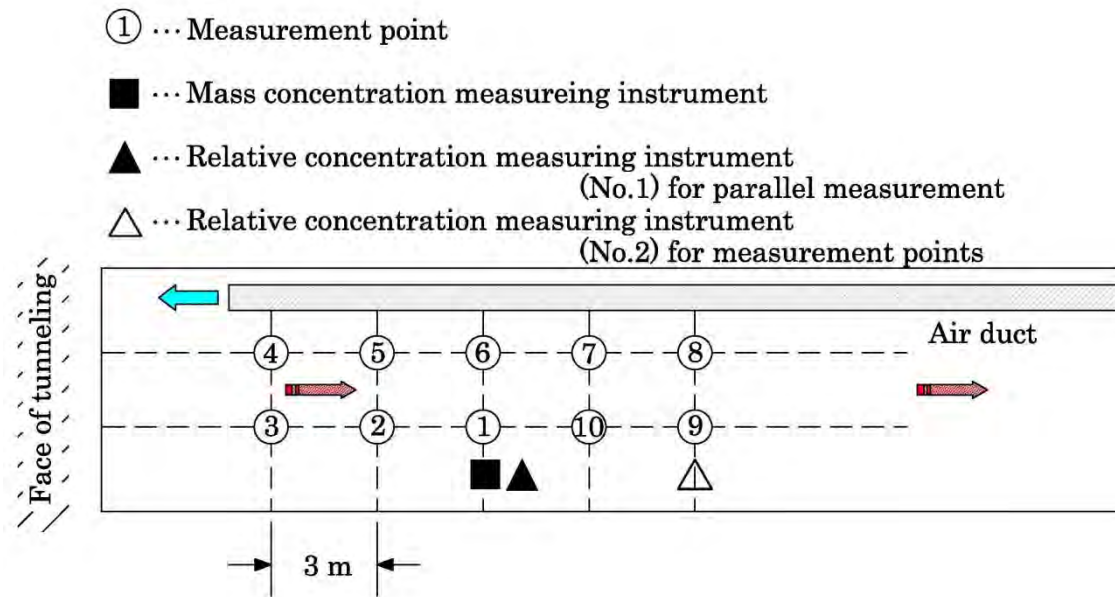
Determination of measurement points on the unit working place in an underground tunneling
